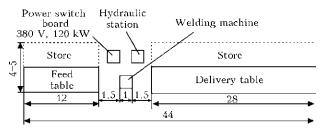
Scheme of line for welding of concrete reinforcement bars in construction site
